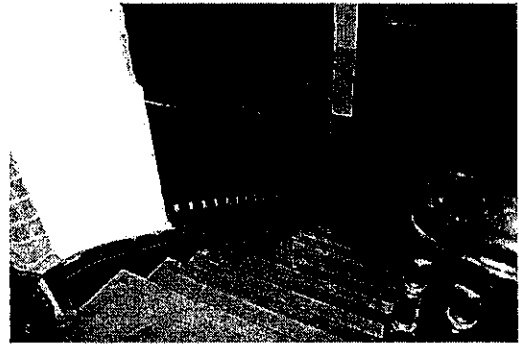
Interior, Landing & Stairs (space FF12). View of upper flight of stairs. Note the introduced timber stair balustrade (to the left).
